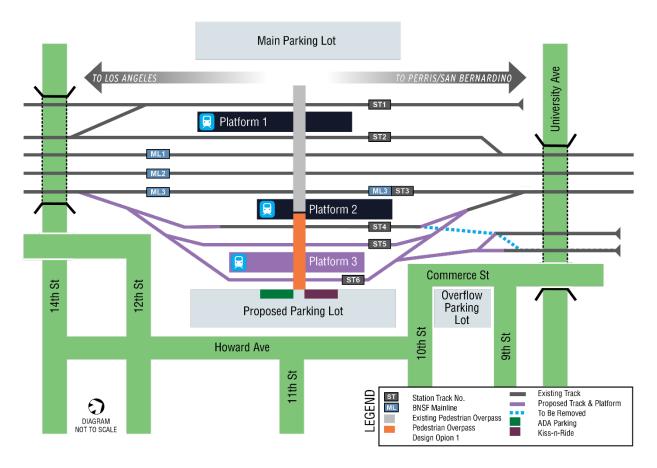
Build Alternative with Pedestrian Overpass Access Design Option 1
